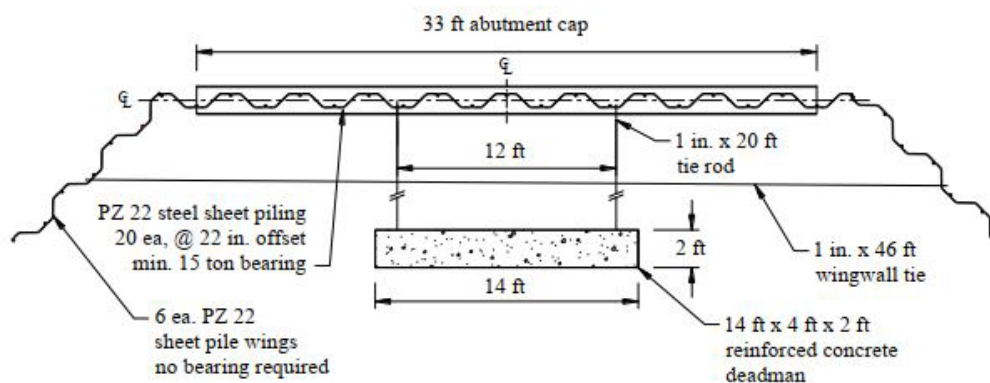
A plan view of the sheet pile abutment and backfill retaining system for demonstration projects in BHC, Iowa (Evans et al., 2011).
